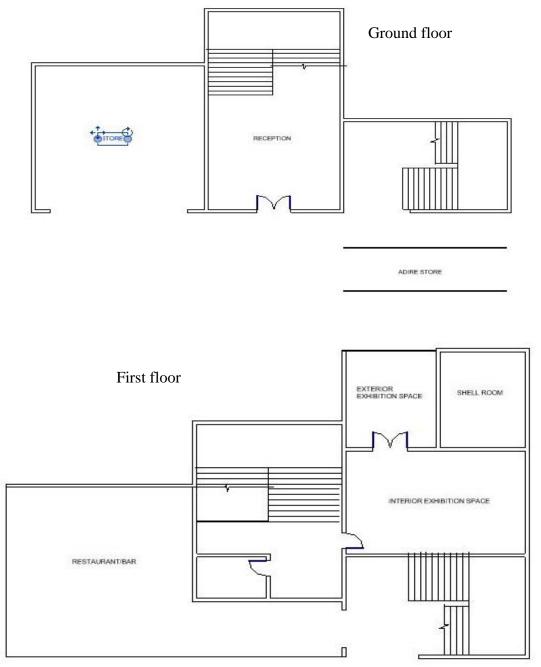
1Floor plans of Nimbus gallery, Ikoyi, Lagos Source: Author's fieldwork (2021)
